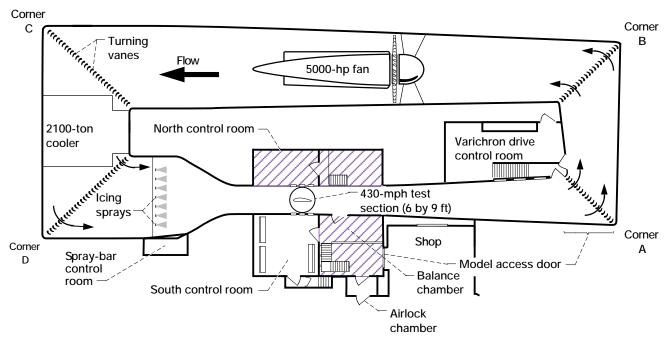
Plan view of Icing Research Tunnel, shop, and control room sections of IRT building.
